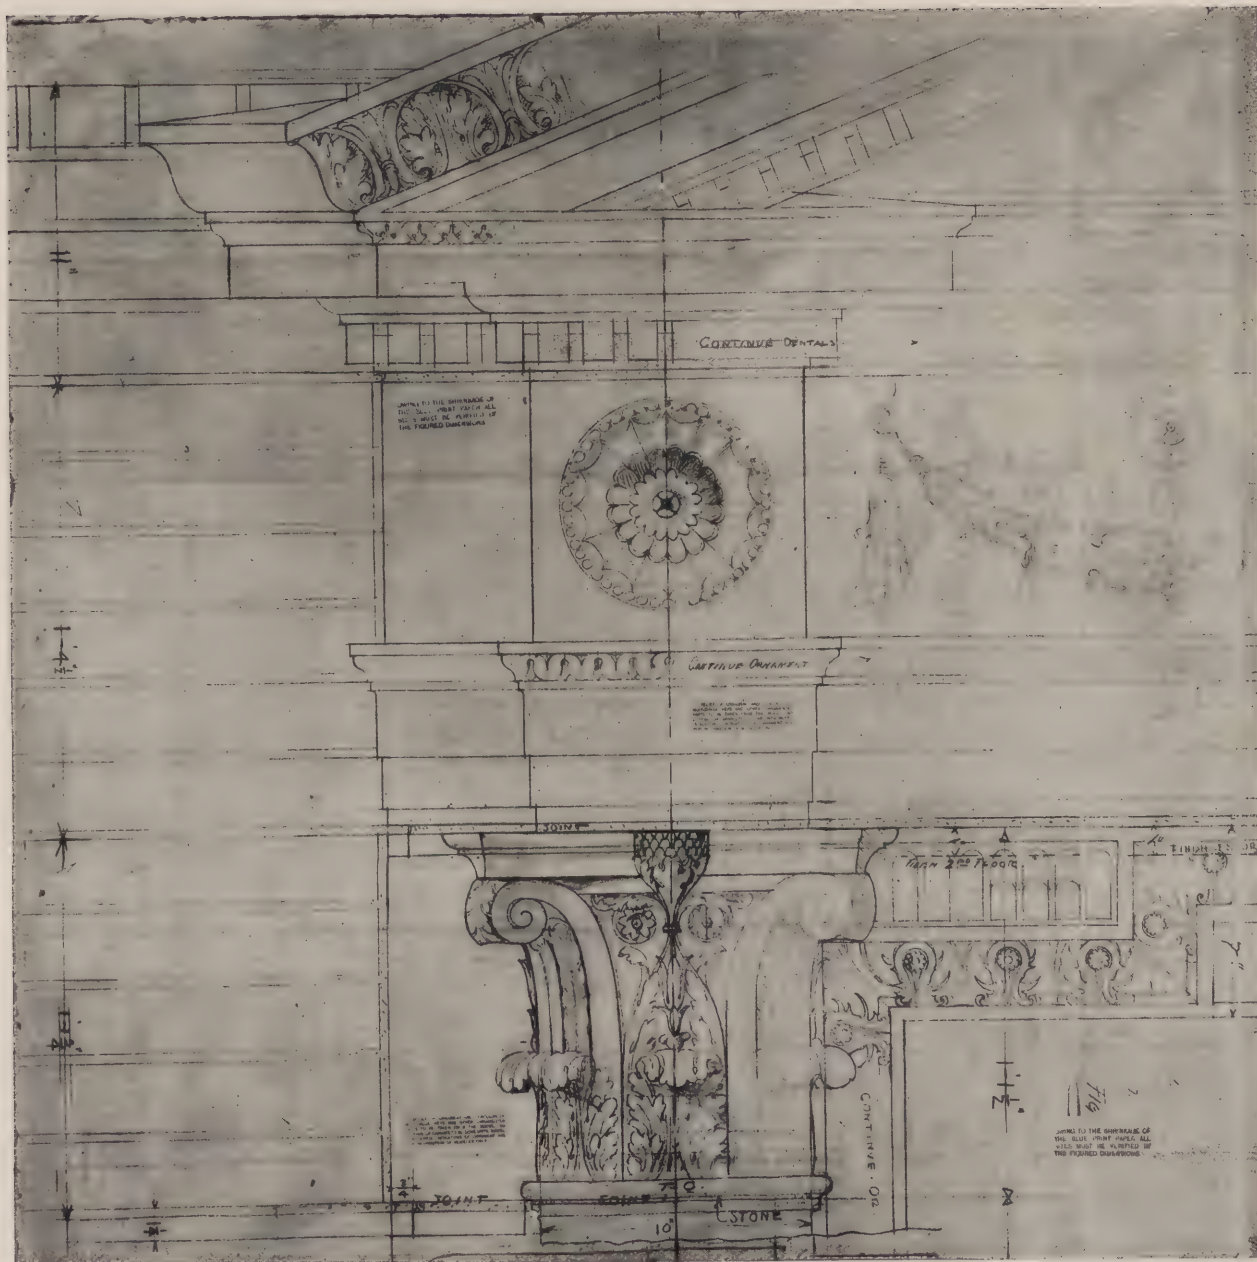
Part of a Full Size Detail for Stone Entrance Door Treatment, Apartment House for 46 West Ninety-fifth Street, Inc., New York City. Carrère & Hastings and Shreve, Lamb & Blake, Architects.
